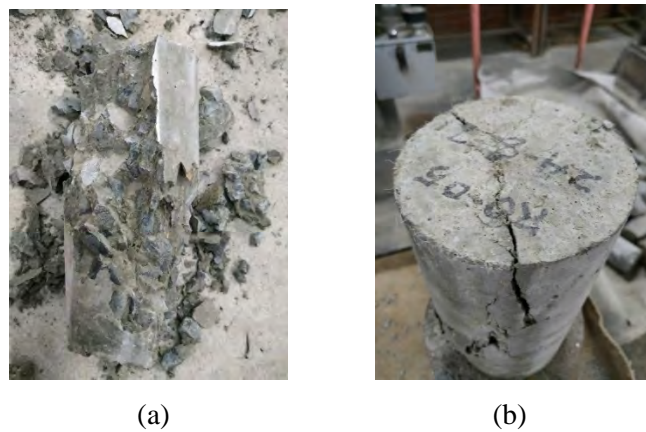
Failure pattern of concrete cylinder under compressive load
